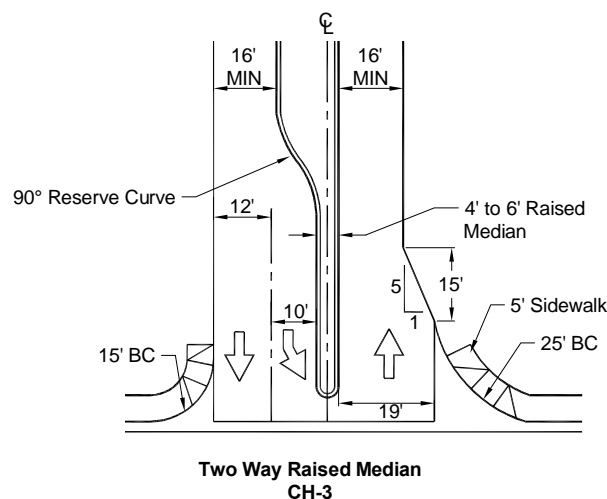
TYPE CH TWO WAY DRIVEWAYS WITH RAISED MEDIAN
